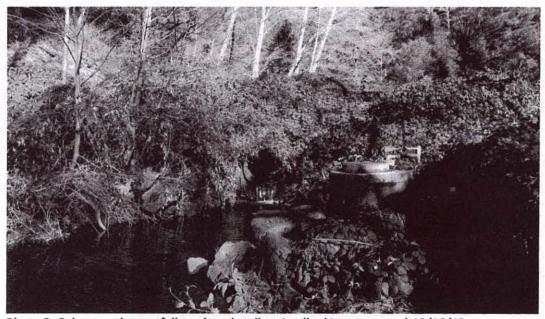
Culvert outlet, outfall pool, and well casing (looking upstream) 12/16/13.
